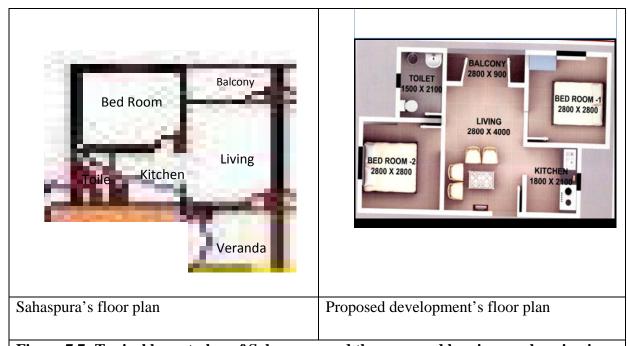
Typical layout plan of Sahaspura and the proposed low-income housing in Colombo
